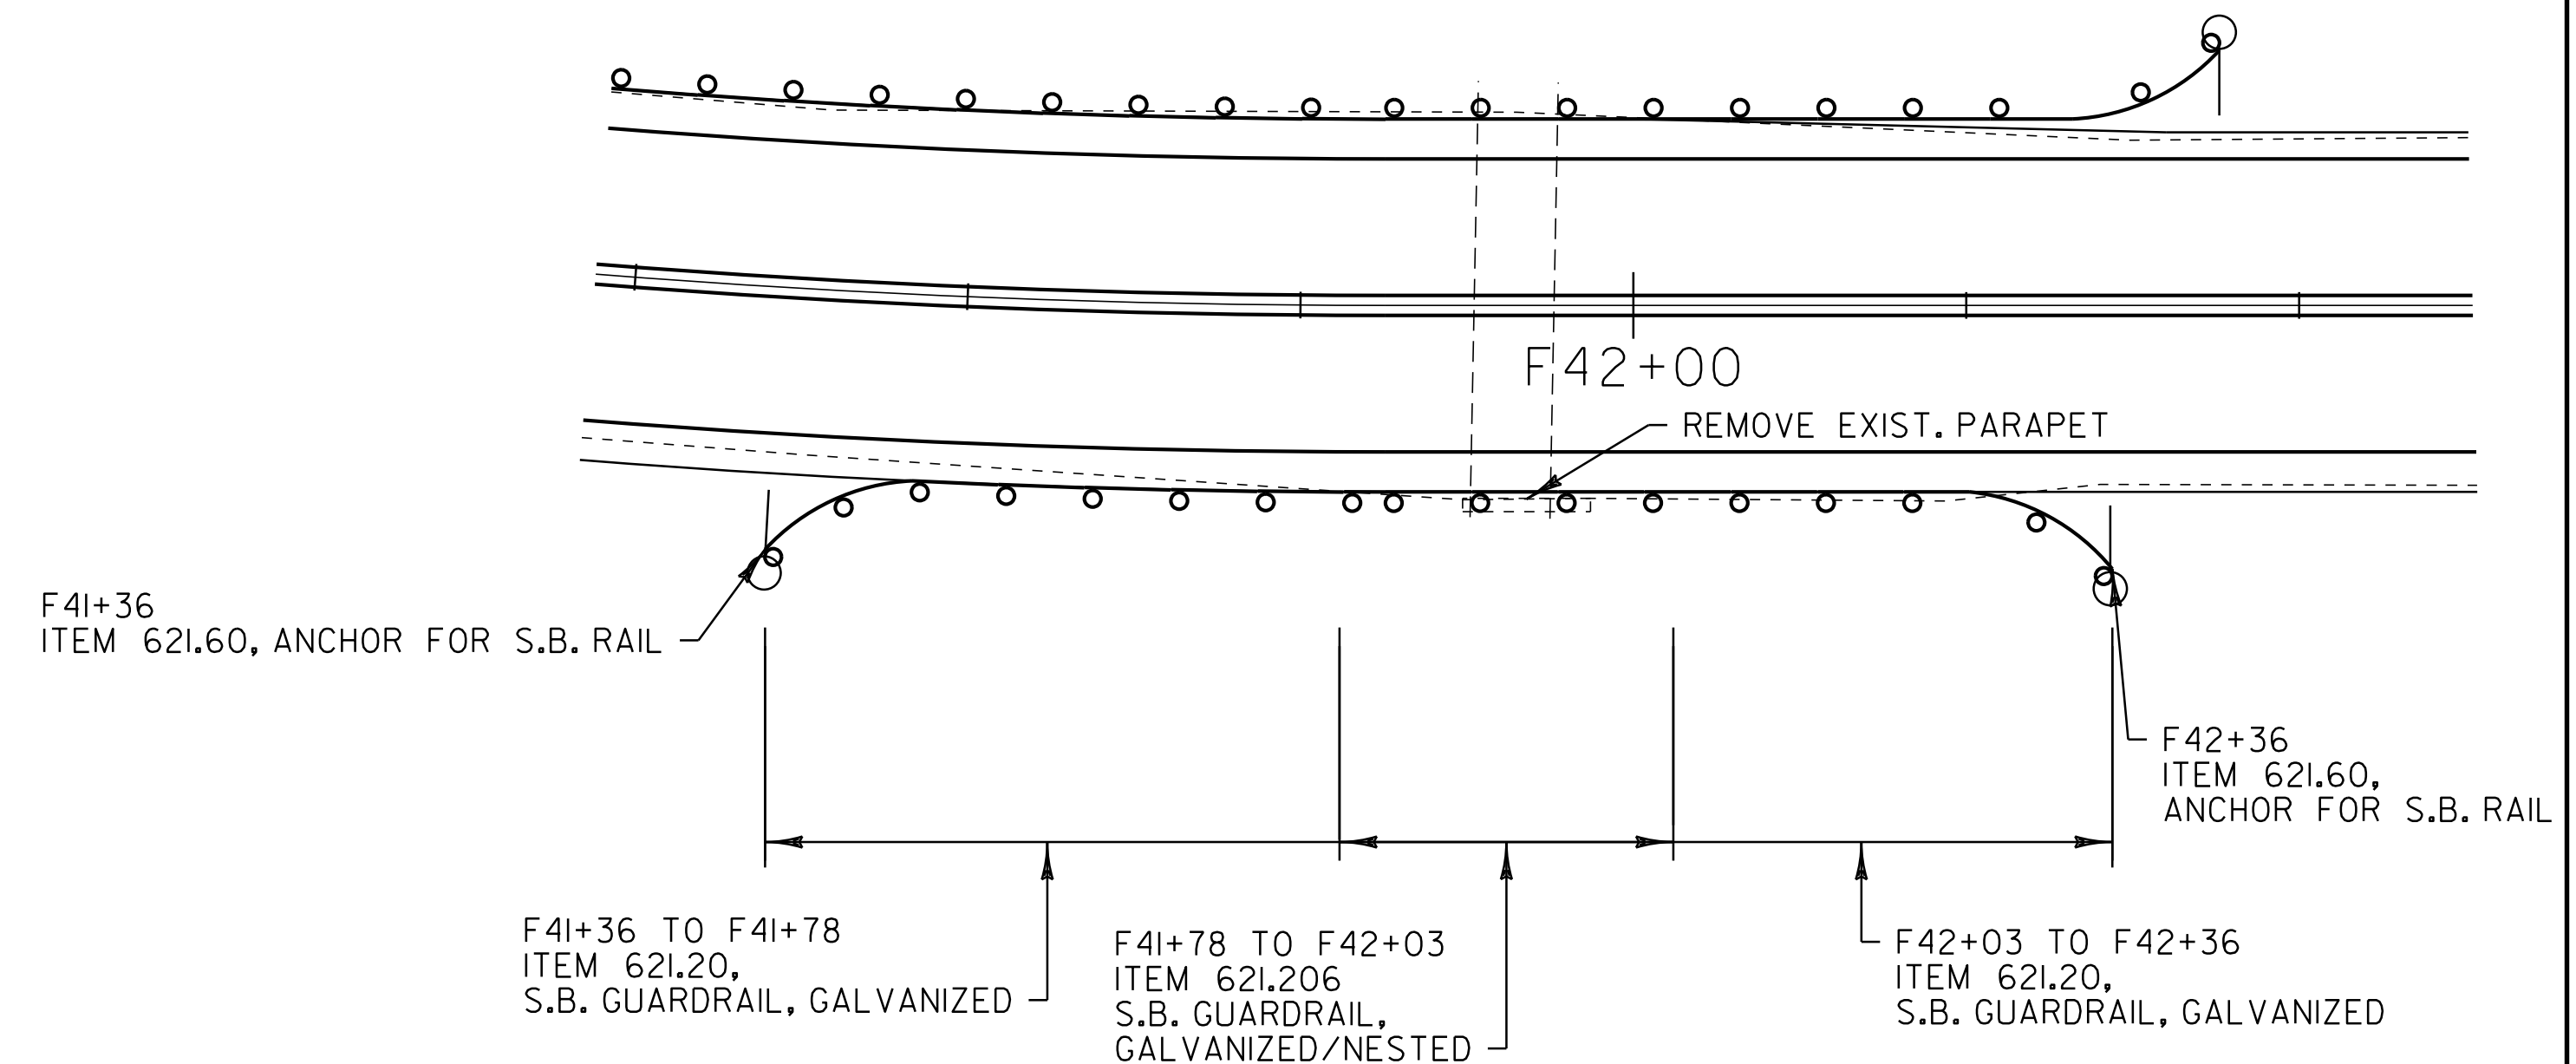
DETAIL OF STEEL BEAM GUARDRAIL AT SMALL CULVERTS
